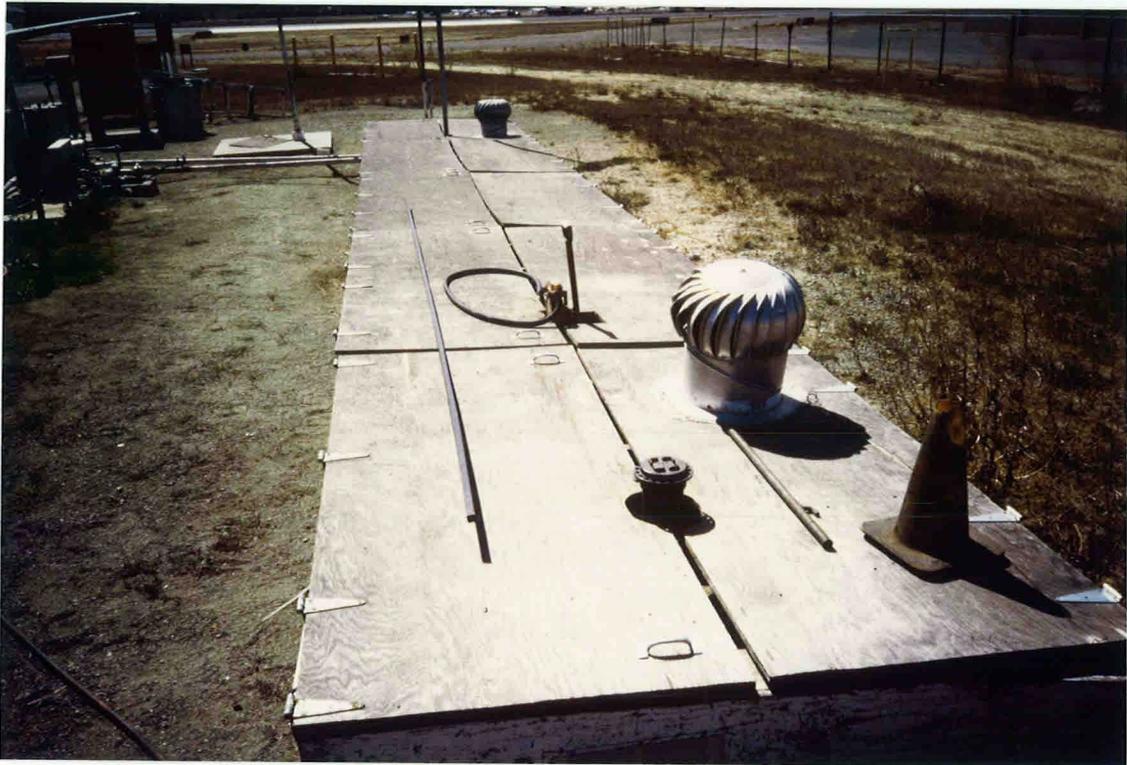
UST at American Eagle/Wings West hangar. View southwest.
